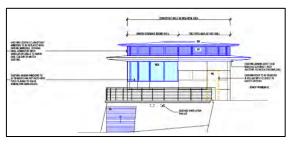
Approved beach elevation of Lifeguard Tower, Tunnel 2 and Amenities block.
